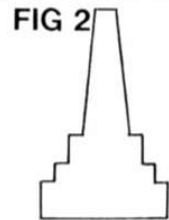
The slender shaft of a modern pier resting on the widened base of the foundation.
